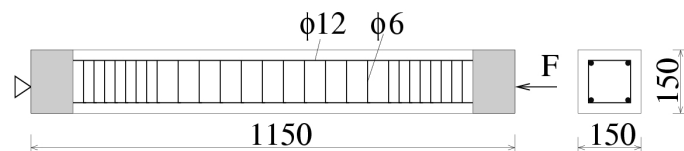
Geometry of specimens in mm (drawn in horizontal position).
